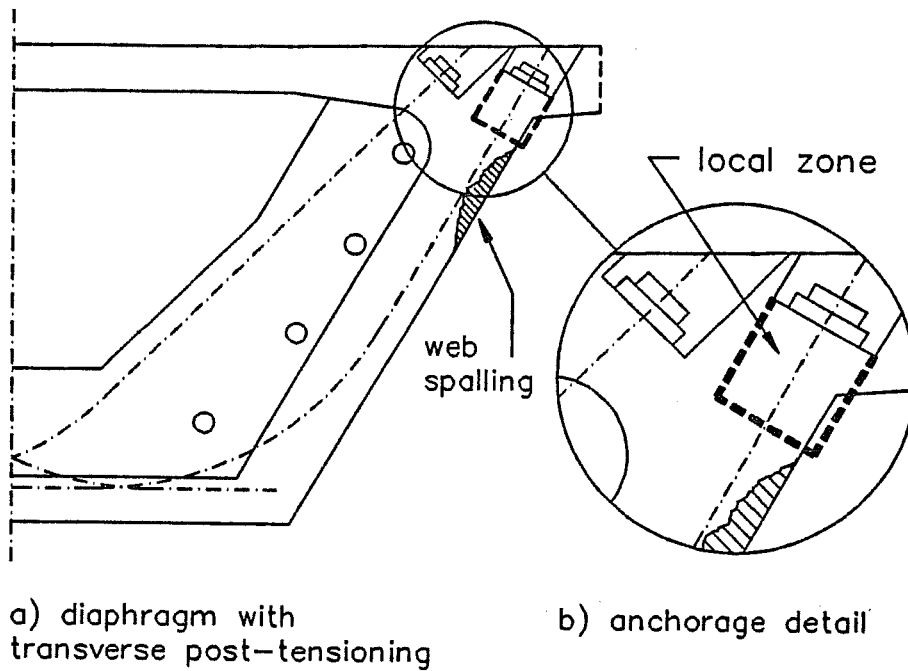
Concrete Spalling Due to Insufficient Attention to Local Zone Details
